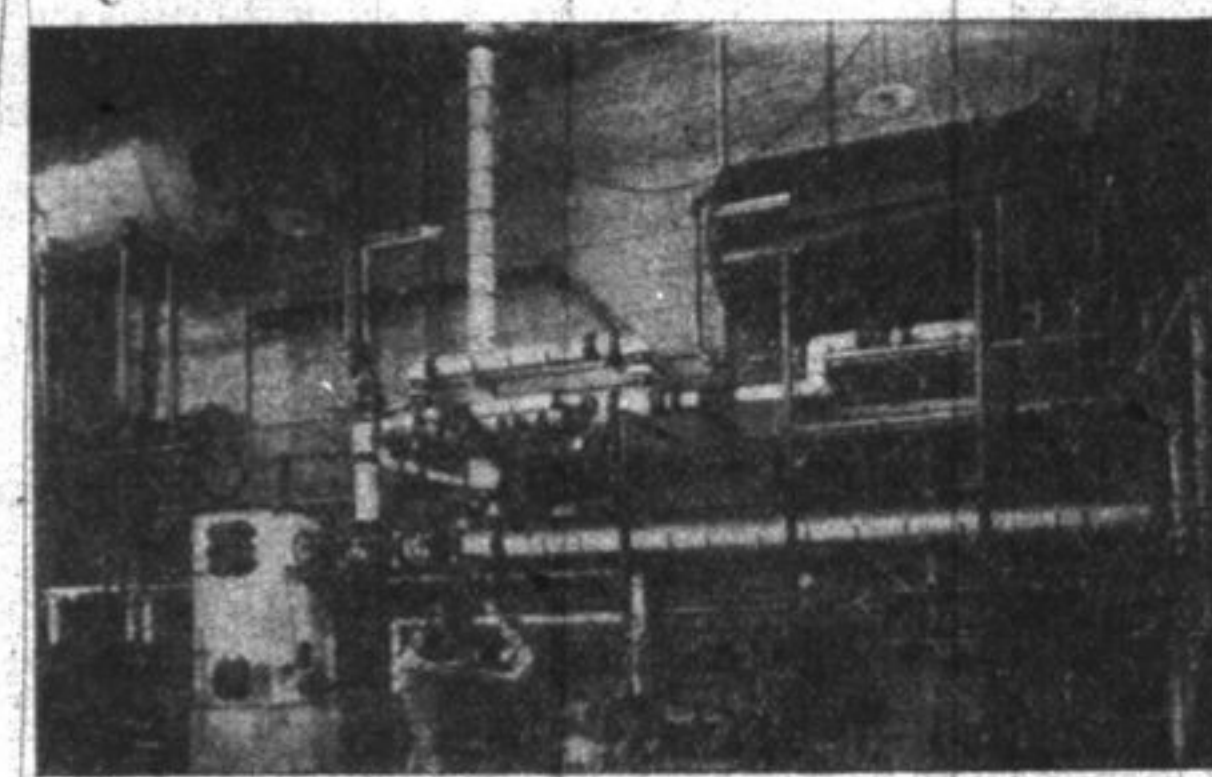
VIEW IN BOILER ROOM SHOWING HOT WELL, HEATERS, AND BOILER FEED AND VACUUM PUMPS
